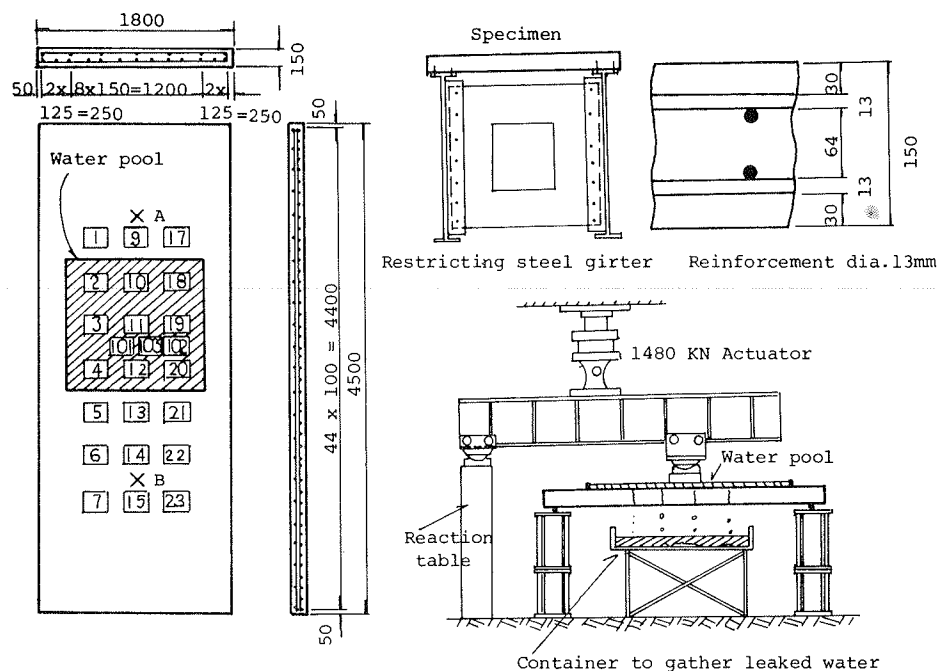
Shape of specimen, loading points, and loading apparatus.
